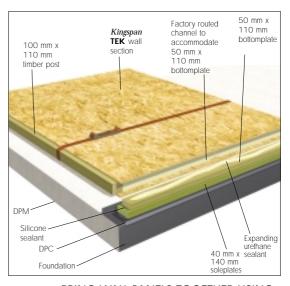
BRING WALL PANELS TOGETHER USING RATCHET STRAPS
